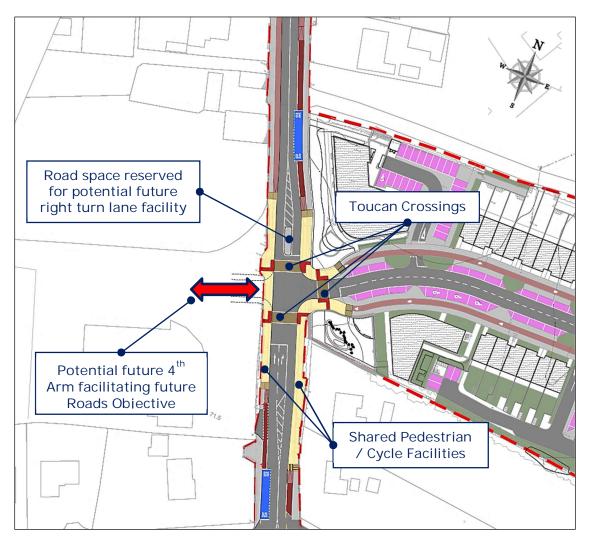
Proposed Site Access on R443 Clonminch Rd
